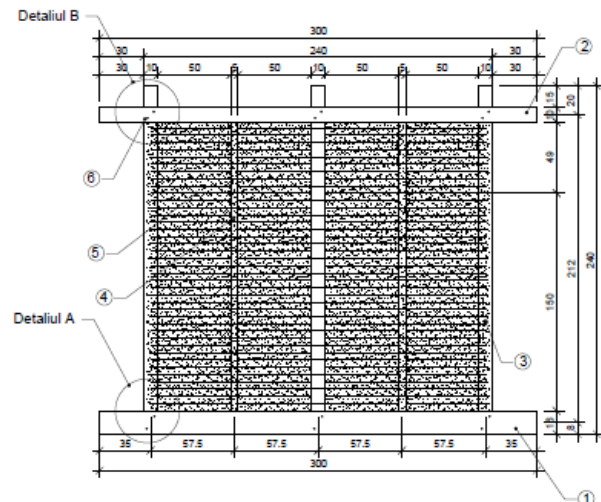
Specimen S3 (from type 3) - timber and wattle&daub infill structure: 1 – inferior stringer; 2- superior stringer; 3 – column; 4 – wattles; 5 – daub (earth and straw infill role); 6 – iron nails and cross – halving connections of timber elements (columns and stringers)
